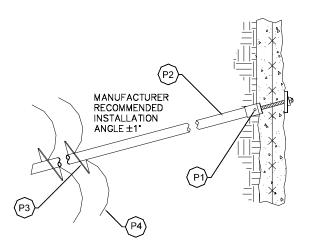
TYPE D TENSION ANCHOR APPLICATION
